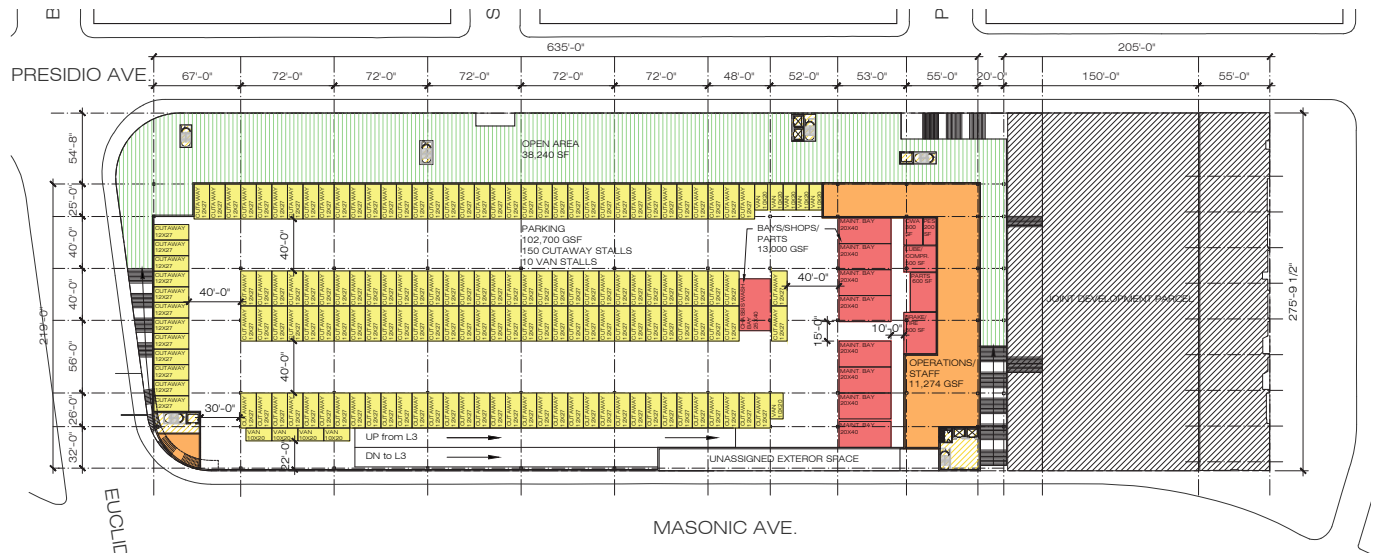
BUS FACILITY CONCEPT DESIGN - ROOF LEVEL BUILT OUT PLAN
